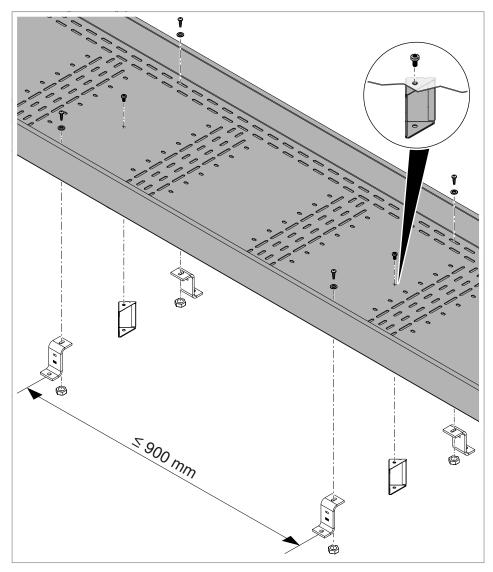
Mounting of additional support on cable tray ≥ 500 mm
